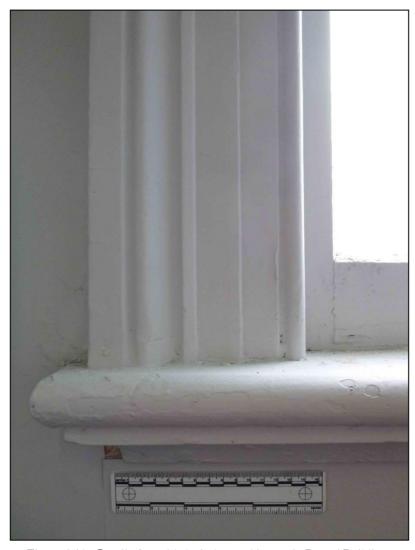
Detail of moulded window architraves in Peters' Building.
